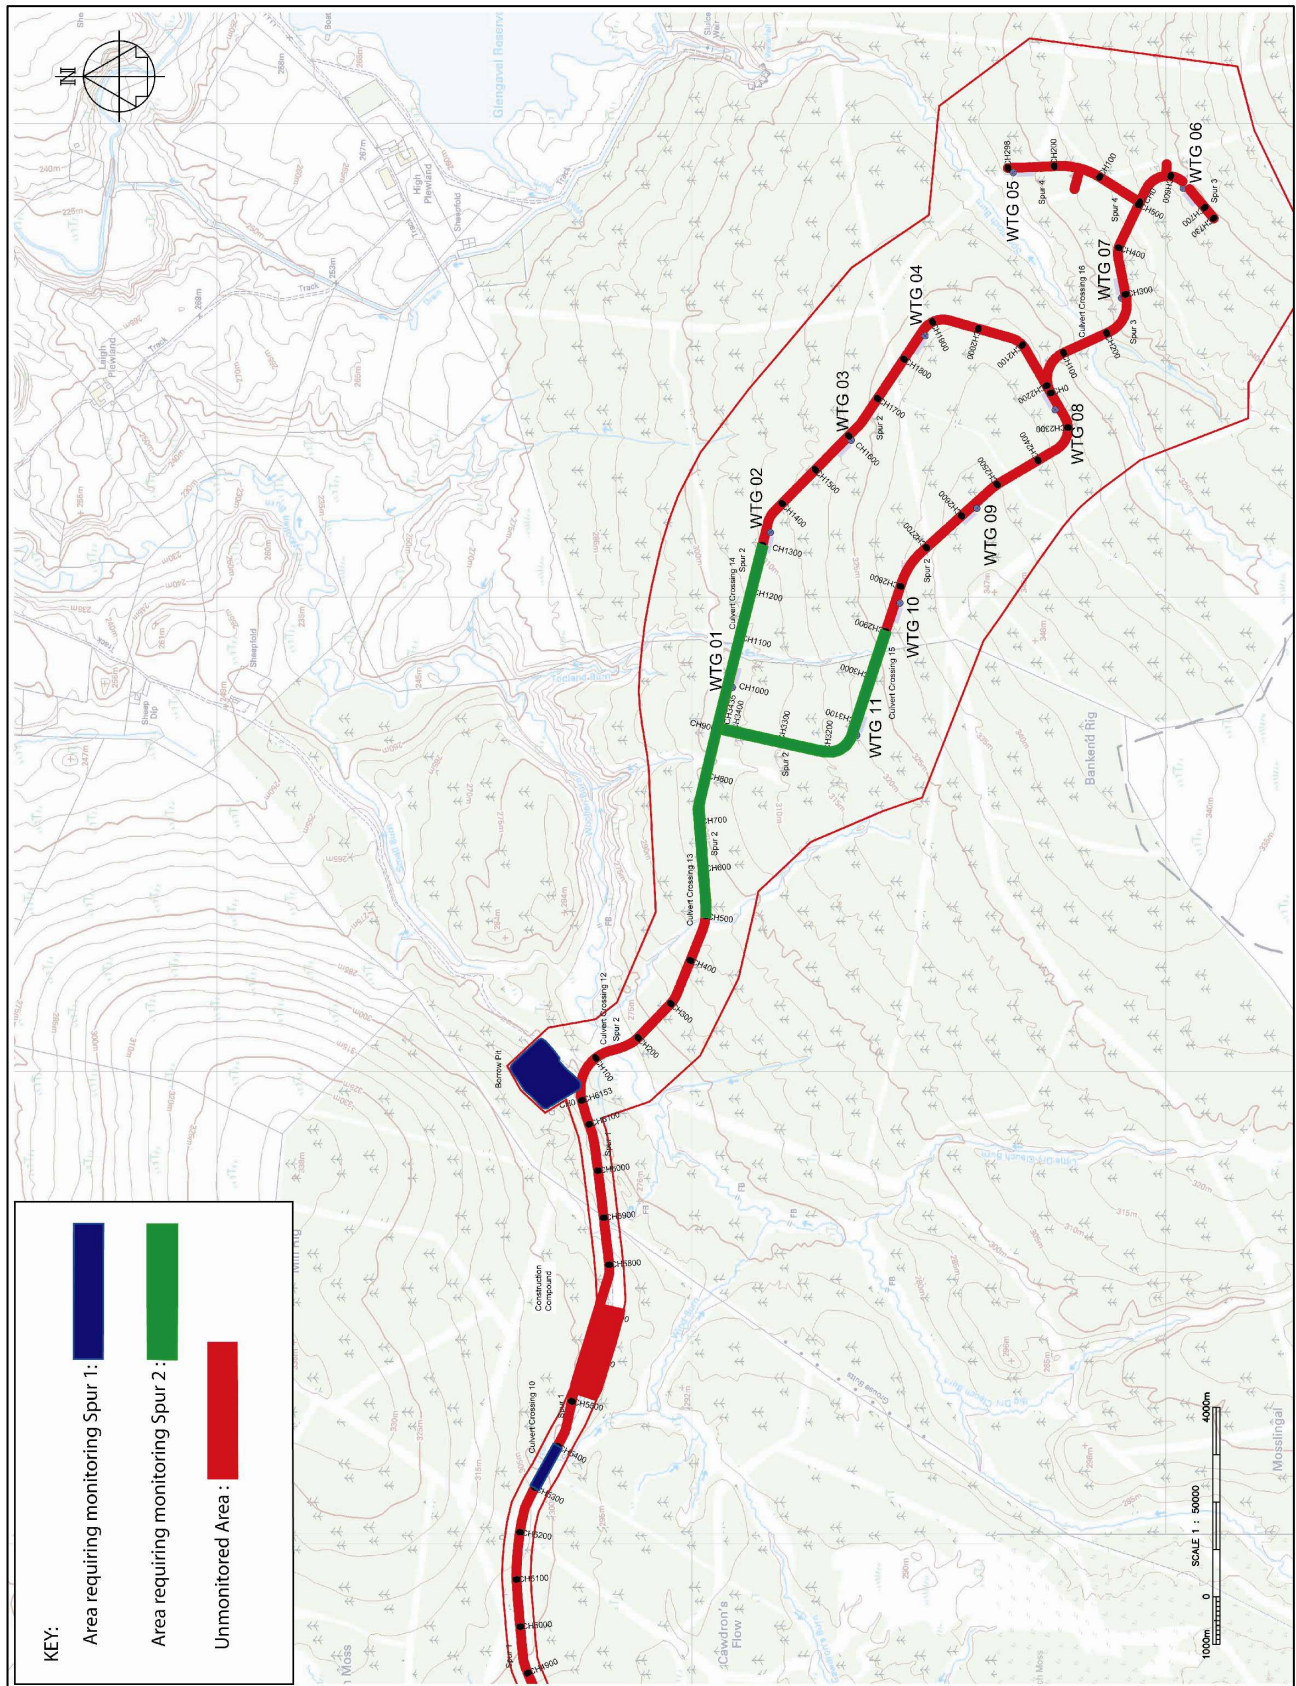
Plan showing the route of the access road through Spurs 1 and 2
